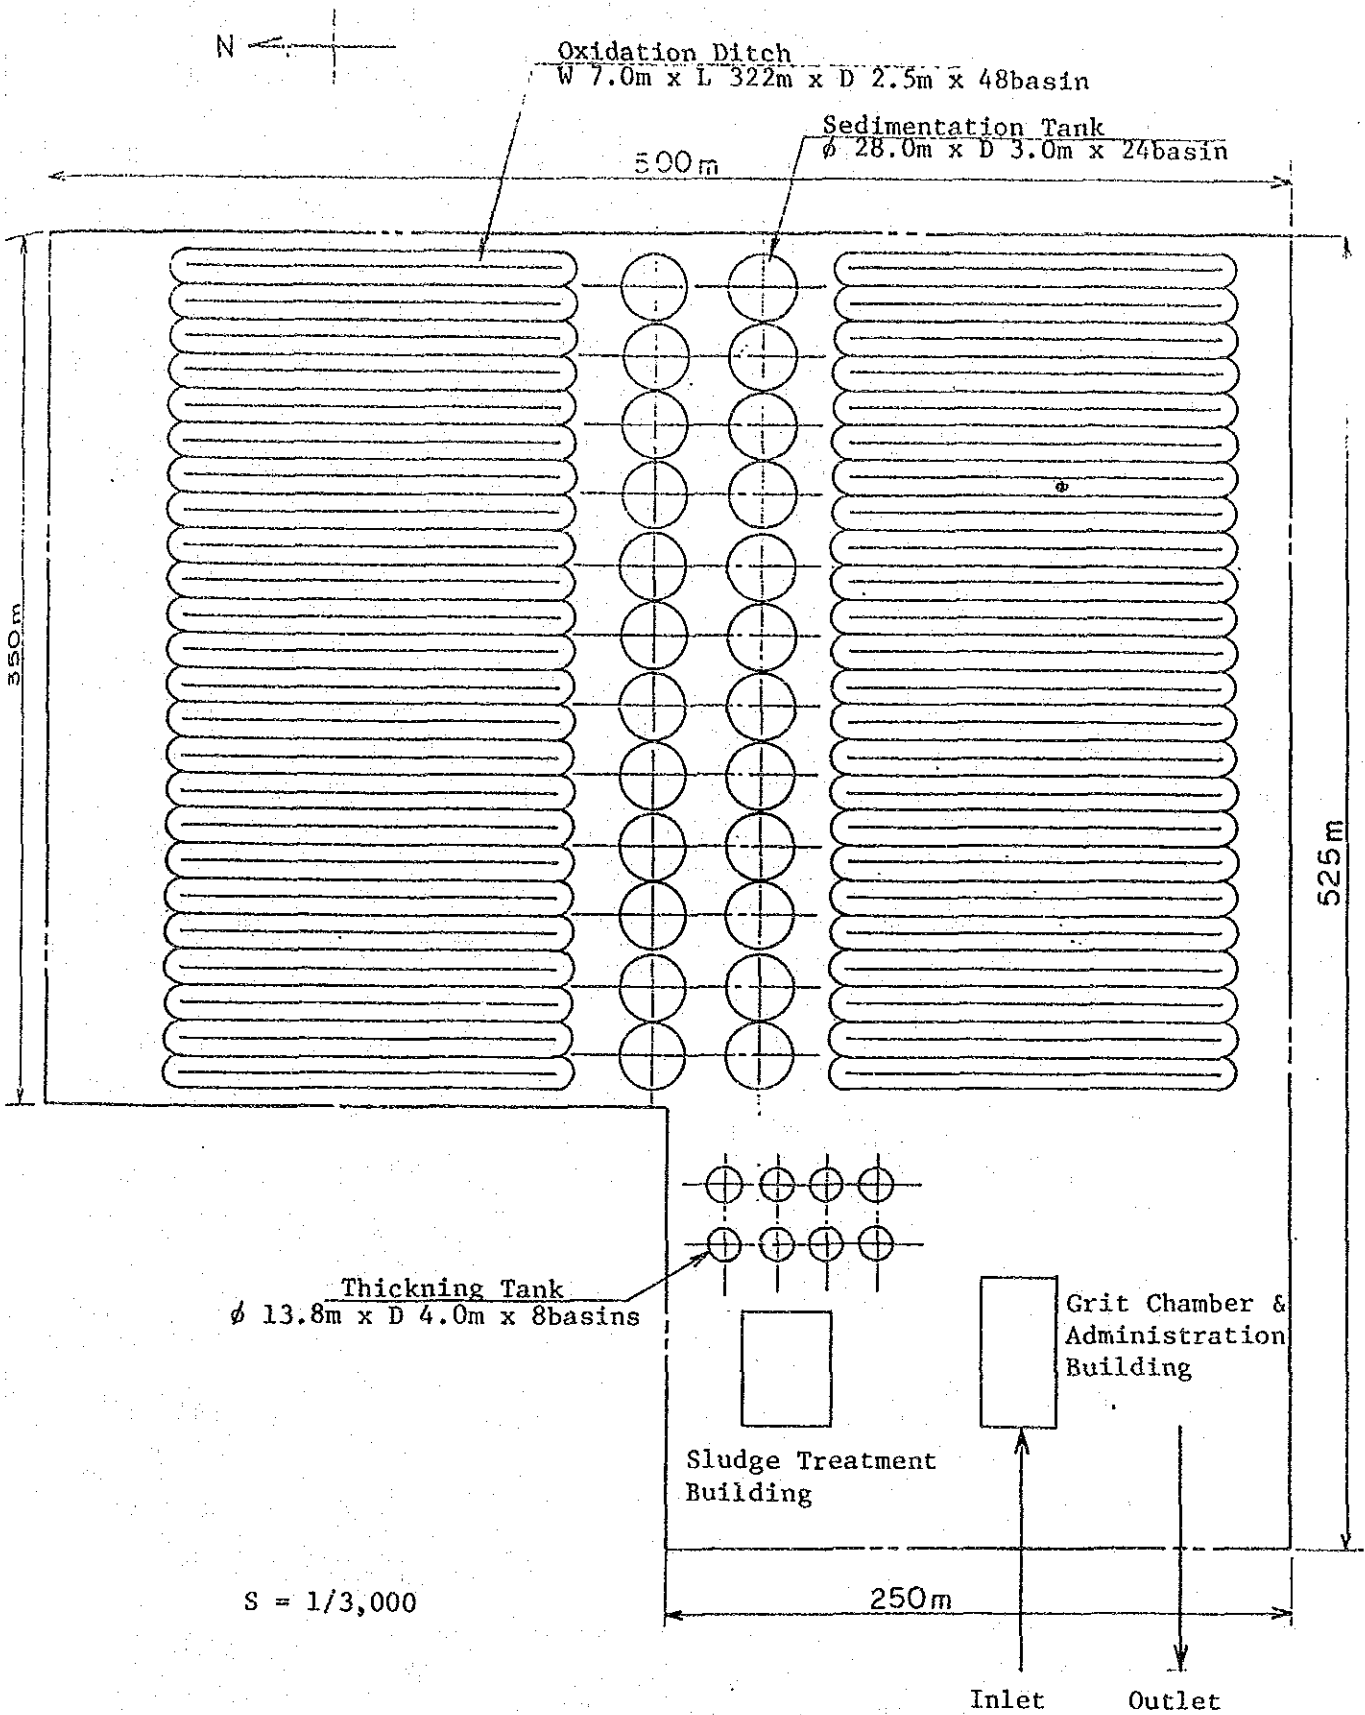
Layout Plan for Oxidation Ditch System in Proposed site "Cerro de la Chira"
